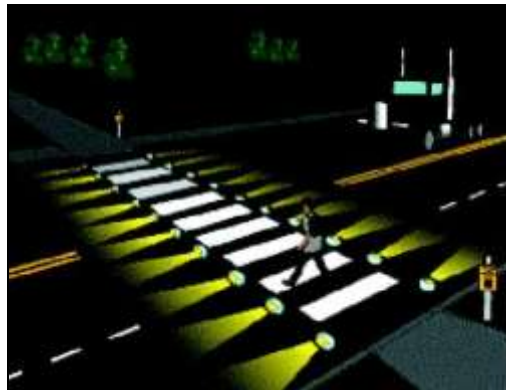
Example of pedestrian crosswalk with in-pavement lighting
